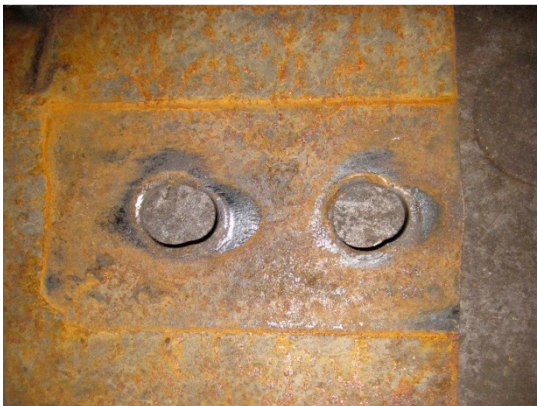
Picture depicting the typical bearing deformations taking place in the intact end.
